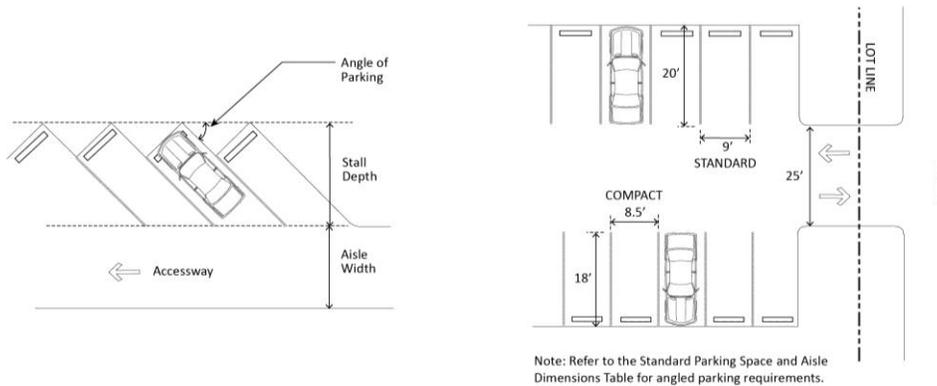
(D.1): STANDARD PARKING SPACE AND AISLE DIMENSIONS
